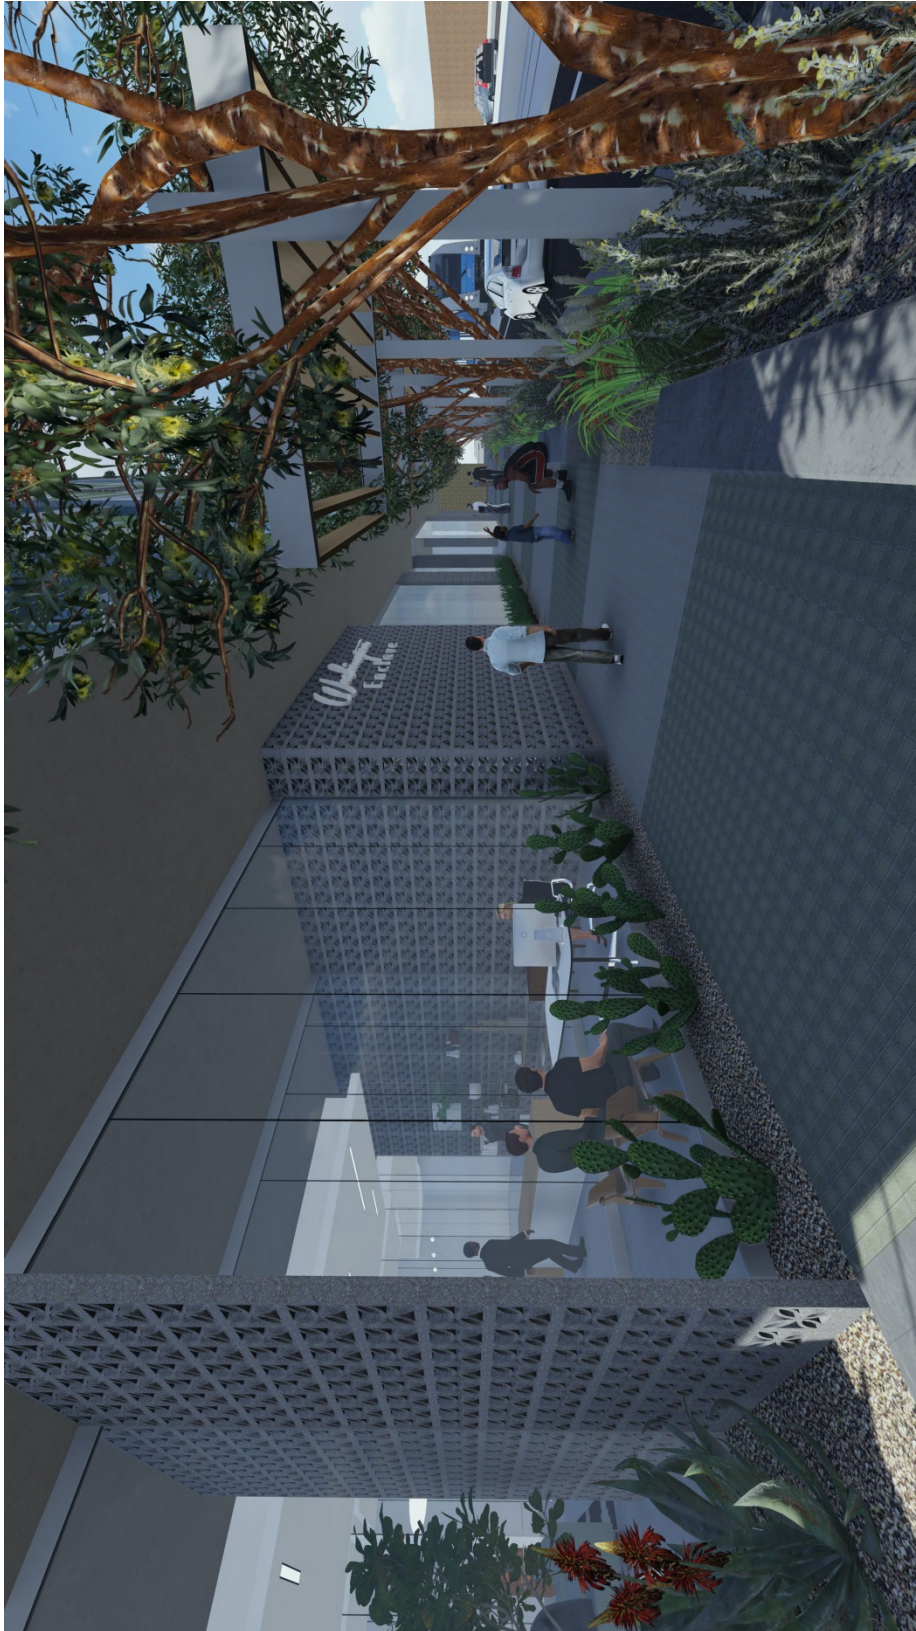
Conceptual Perspective Views - East Ground Floor
